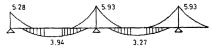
Total B.M.D. column Strip H-H (long Dir")
